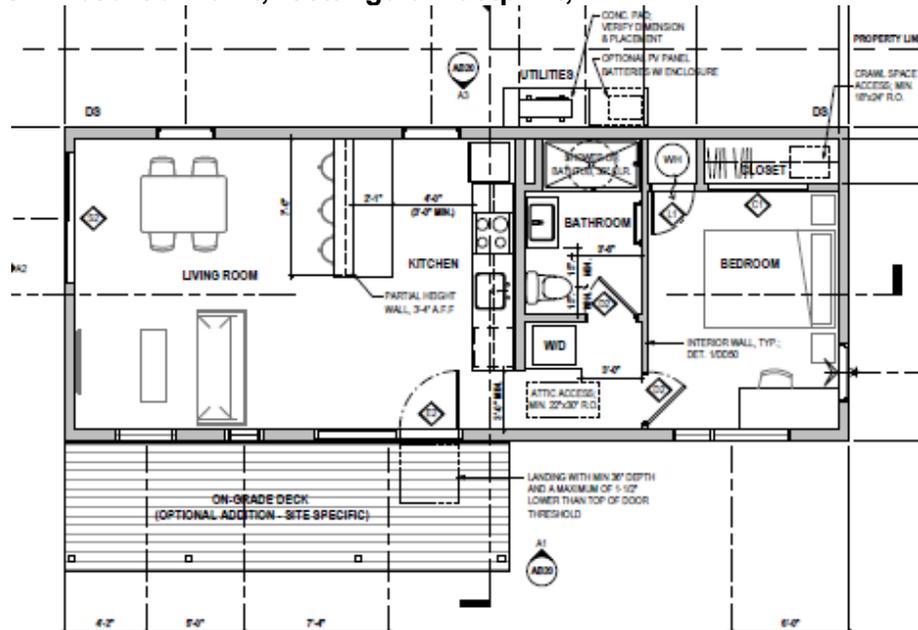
1-bedroom ADU Floor Plan (HEART GLADUR Plans Sheet AB11)
